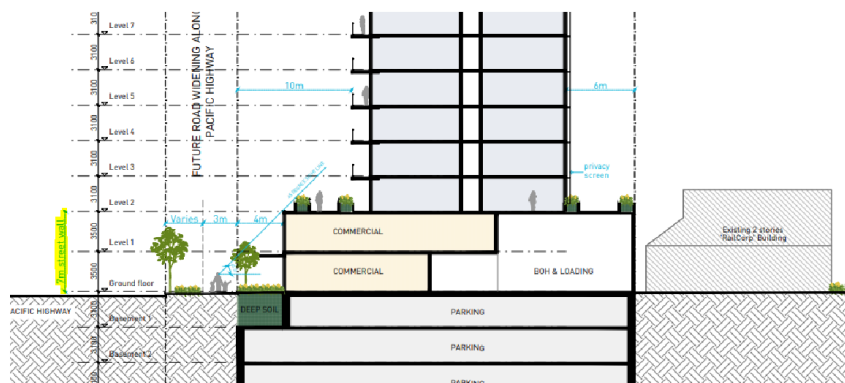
Location of additional pocket park on corner of Pacific Highway and O'Brien Street, with deep soil. Source: PBD Architects, Drawing PP101 and Dwg PP102).
